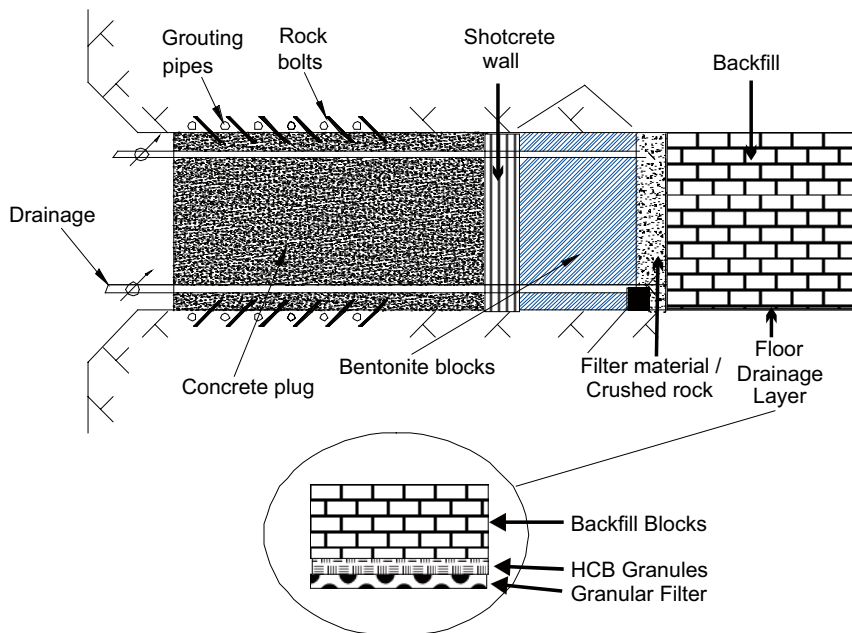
Long Concrete Plug – Bentonite Block – Floor Filter (LCBB-FF) Concept.
